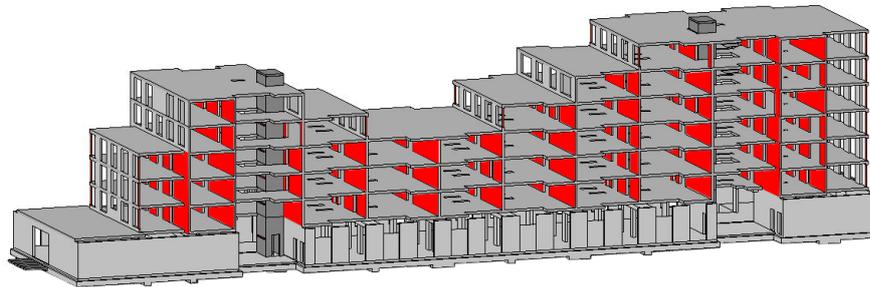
Concrete Walls to CLT Walls in Design Variant 2
